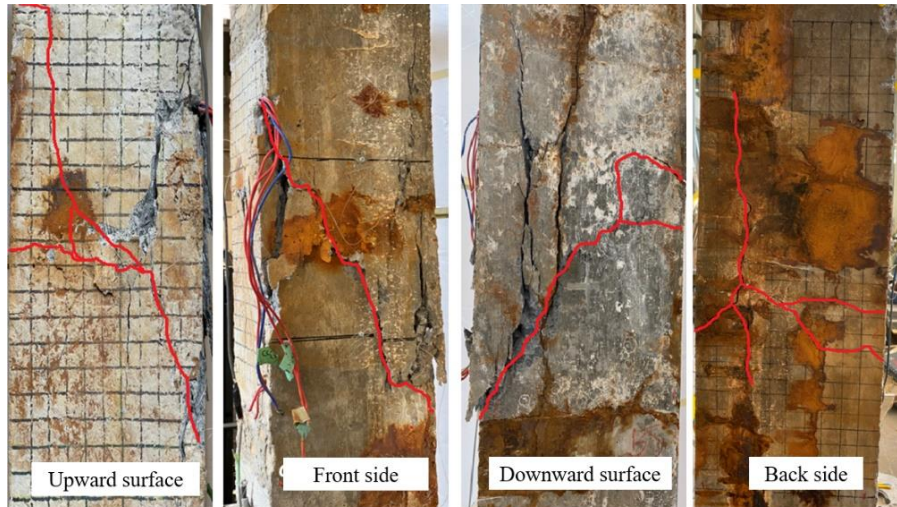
Inclined cracks along column surfaces (C-C-T1)
